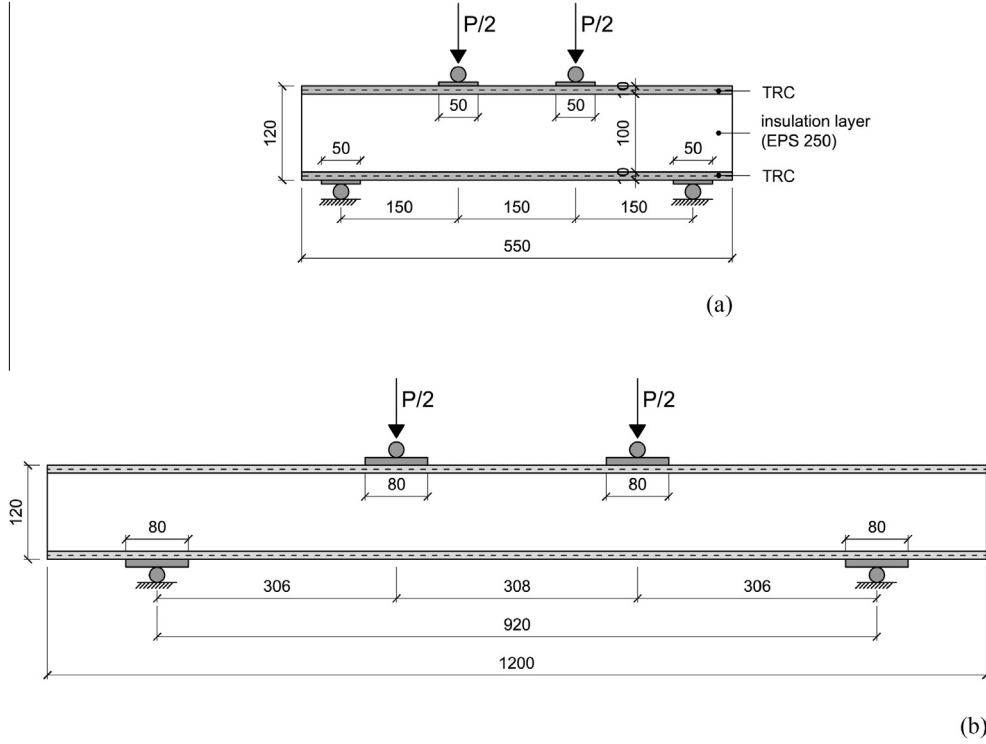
Sandwich beam geometry and test set-up (measures in mm): small “S” (a) and big “B” (b) specimen.
